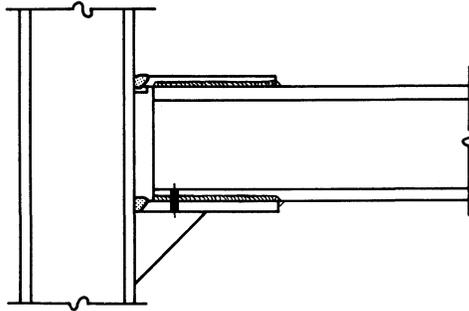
Moment connection using flange connection plates. To avoid high shrinkage strains, beam seat is shop welded to column; top plate weld to column is made in field, followed by fillet welds of top and bottom plates to beam flanges.
